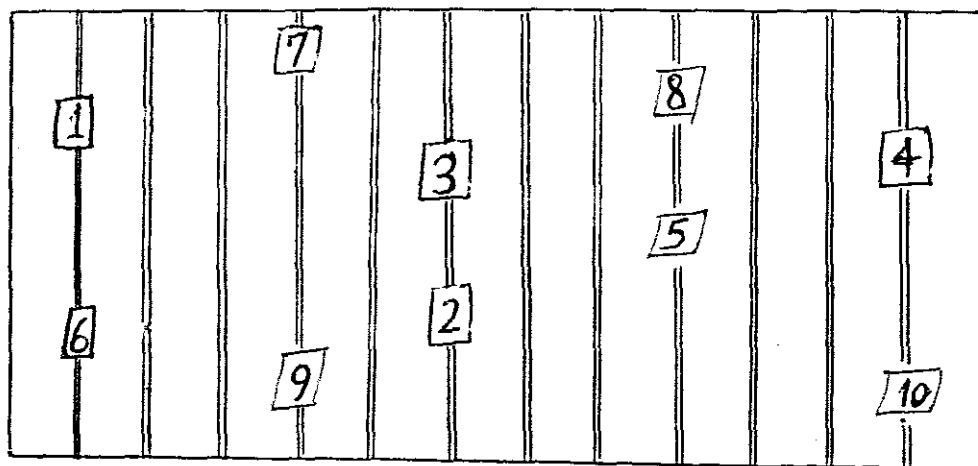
layout of the randomly placed testing papers on the soffit joints.
